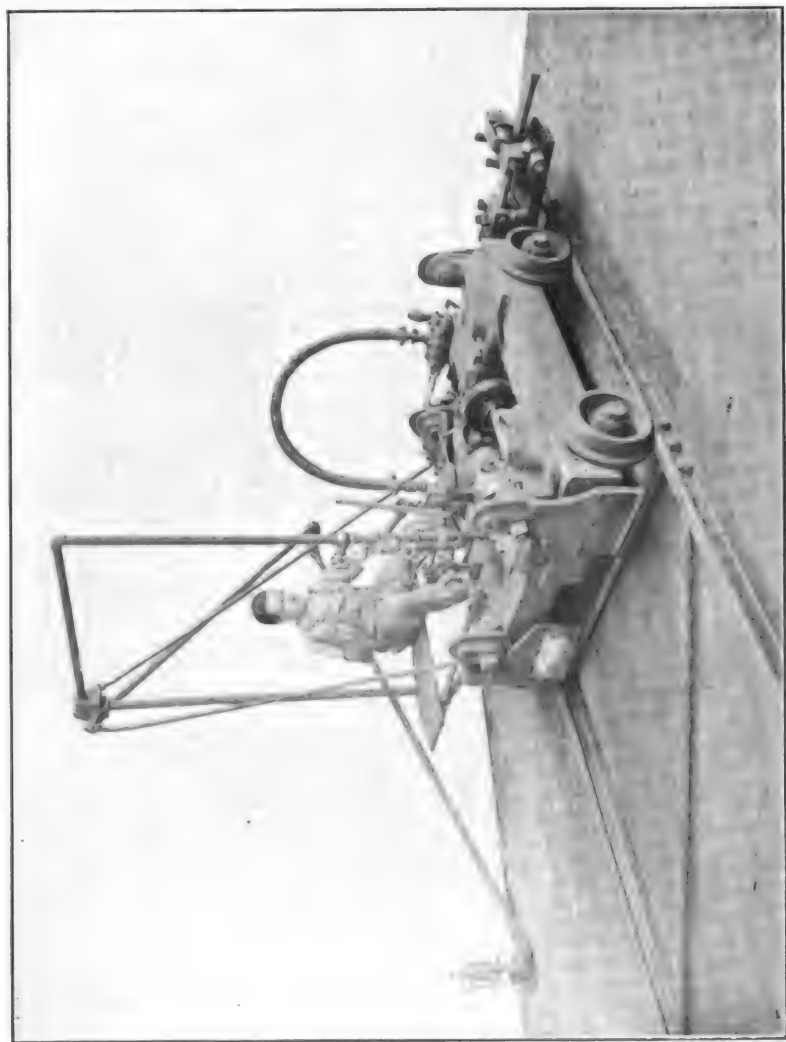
Ingersoll-Rand Undercutting Track Channeler, Type H F-3.
